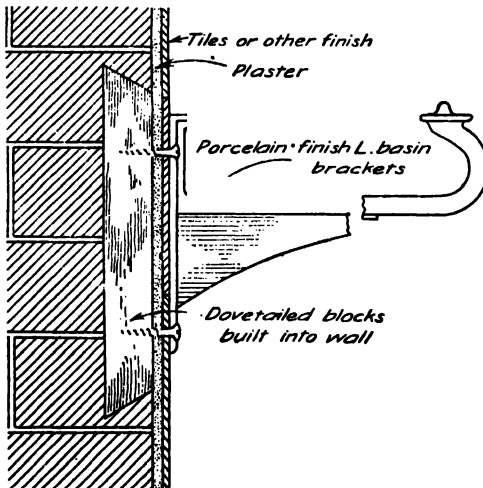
Supports for basin : single dovetailed hardwood block built into wall to take screws of cantilever bracket ; stronger method than that shown in Fig. 7.
